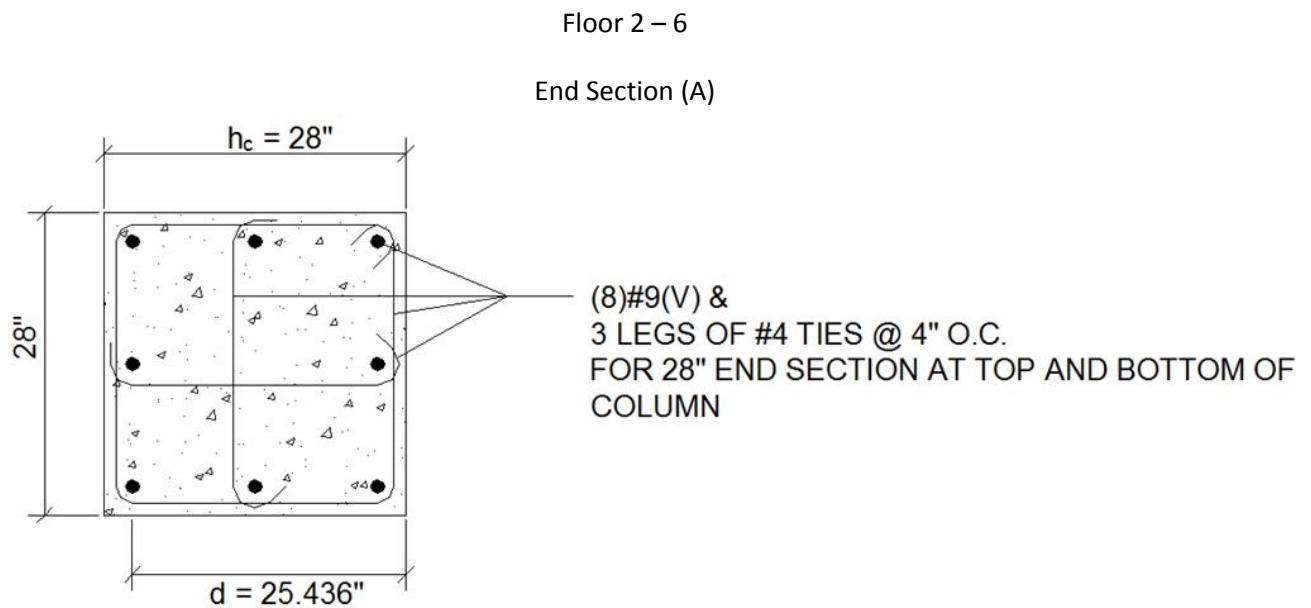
Exterior column, cross-section at end of column at 2nd – 6th floor levels based on SDC D design.
